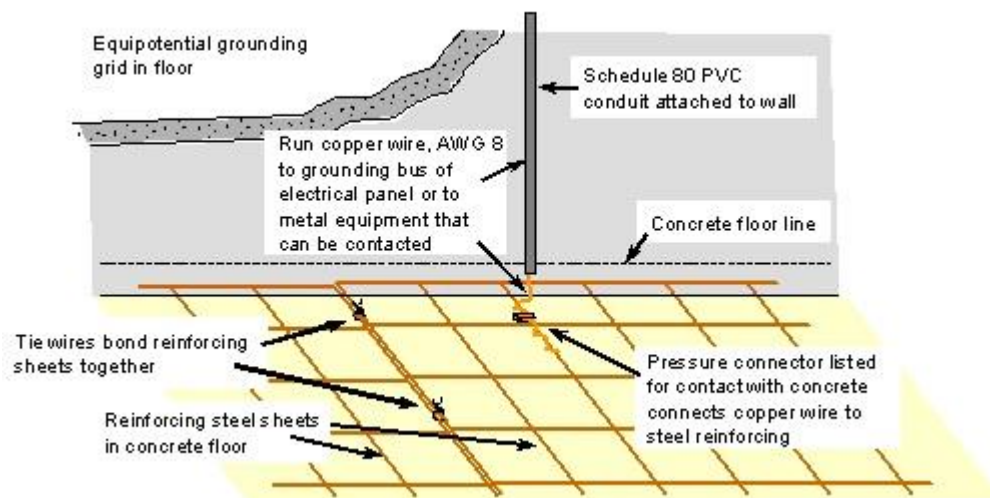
A typical means of establishing an equipotential grid is to insure that reinforcing bars or wire mats installed in concrete floors are connected together and a wire brought out of the concrete for connection to exposed metal equipment or to the grounding bus of the electrical supply panel.
